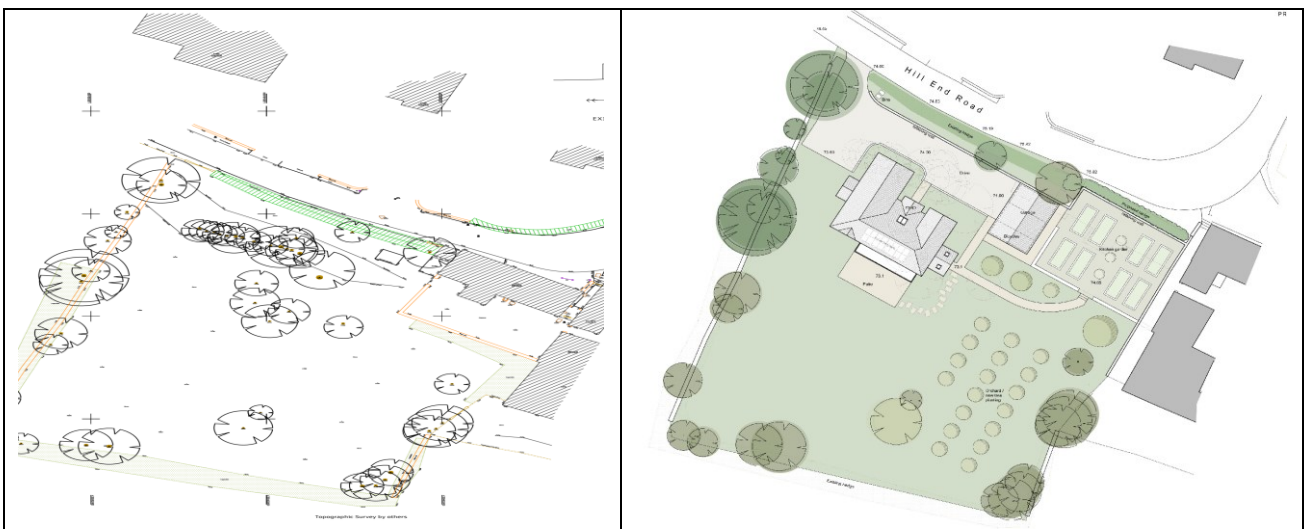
Schematic showing existing building (No. 56) with LHS land parcel, and schematic showing approved Replacement Dwelling on LHS land parcel and existing building (No.56) demolished post or pre-development - Hill End Farm, Hill End Road, Mapplewell, S75 6DU.
